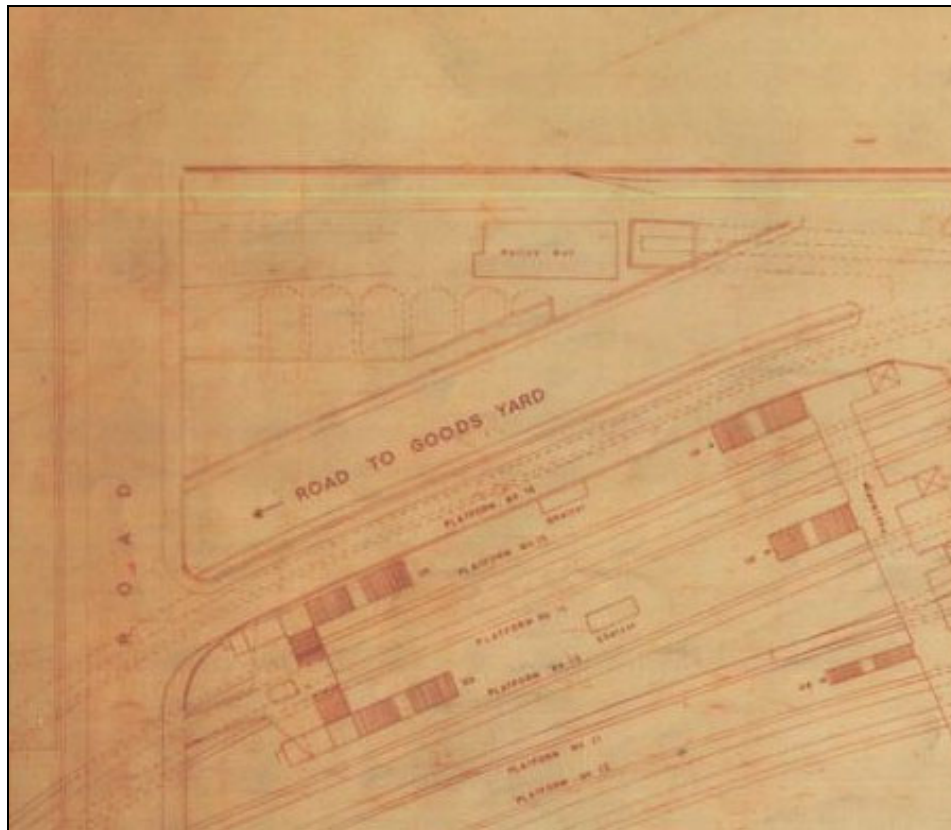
1969 plan identifying truncated vaults, new goods road, taxi rank and extant shunt tunnel.
